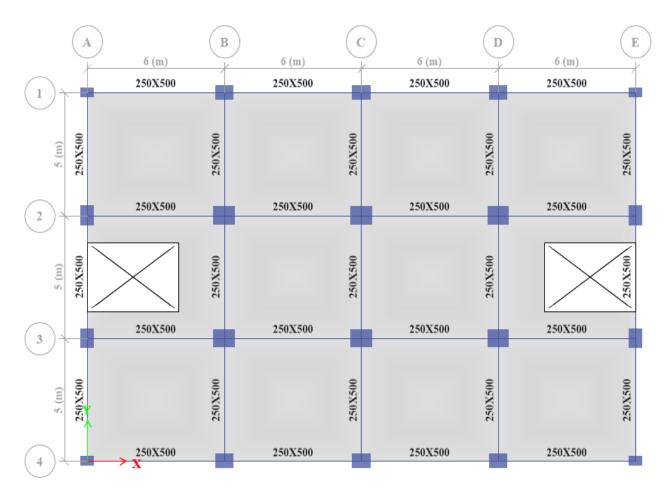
8: 2D Plan Model of Reinforced Concrete Alternative @ 3m
